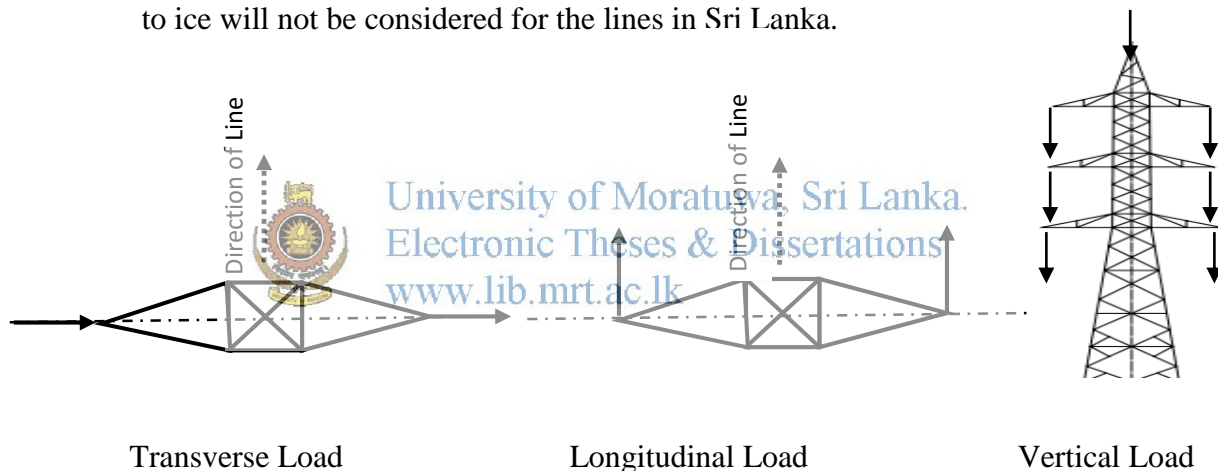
Loading on Tower (Suspension Tower - TDL)
